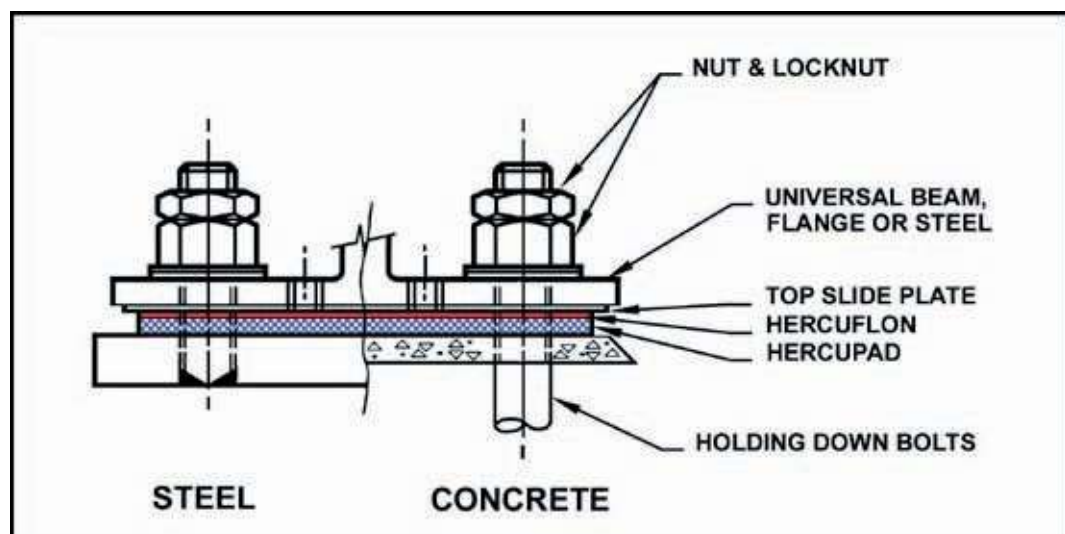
Installation of a Herculon Type D Tank Top Bearing
